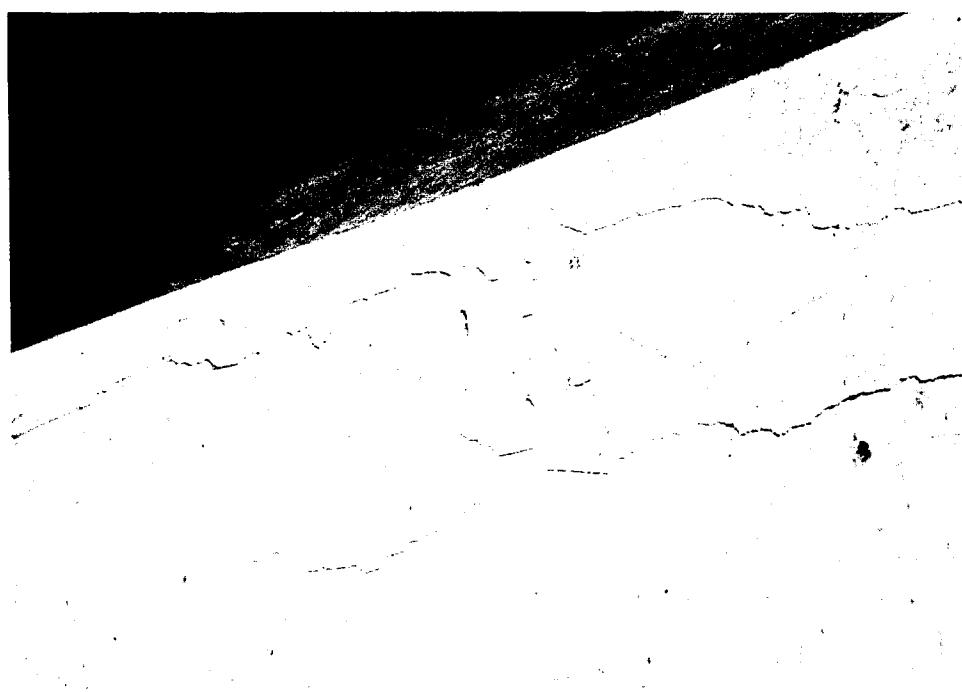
Longitudinal cracks along lakeside edge of south seawall monolith S20
